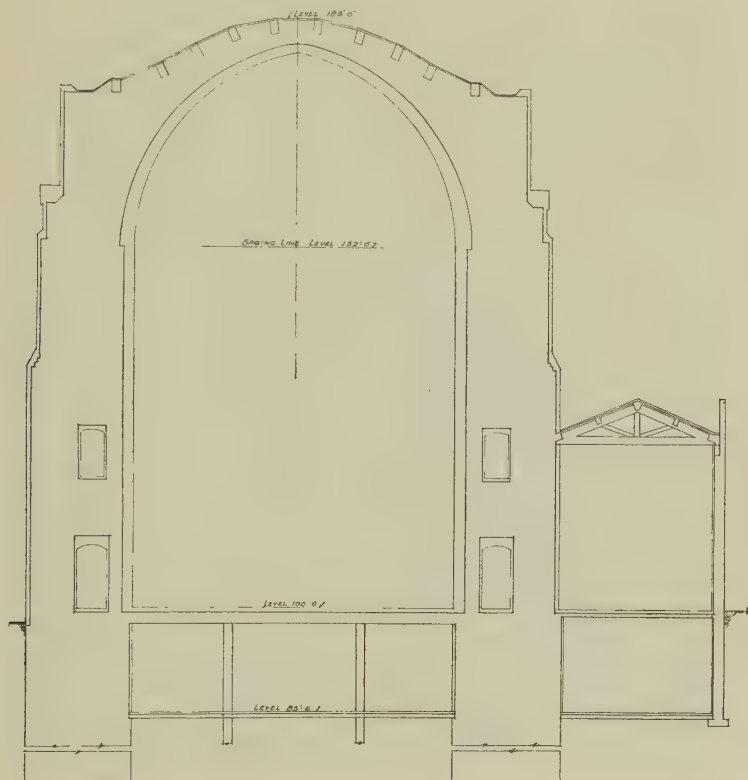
CROSS SECTION, CHURCH OF HEAVENLY REST, NEW YORK CITY.
